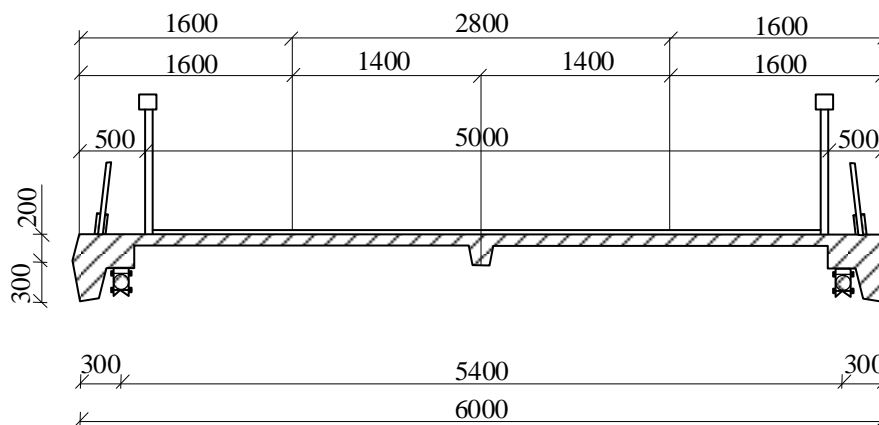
Cross section of the bridge (all dimensions are in millimetres)
